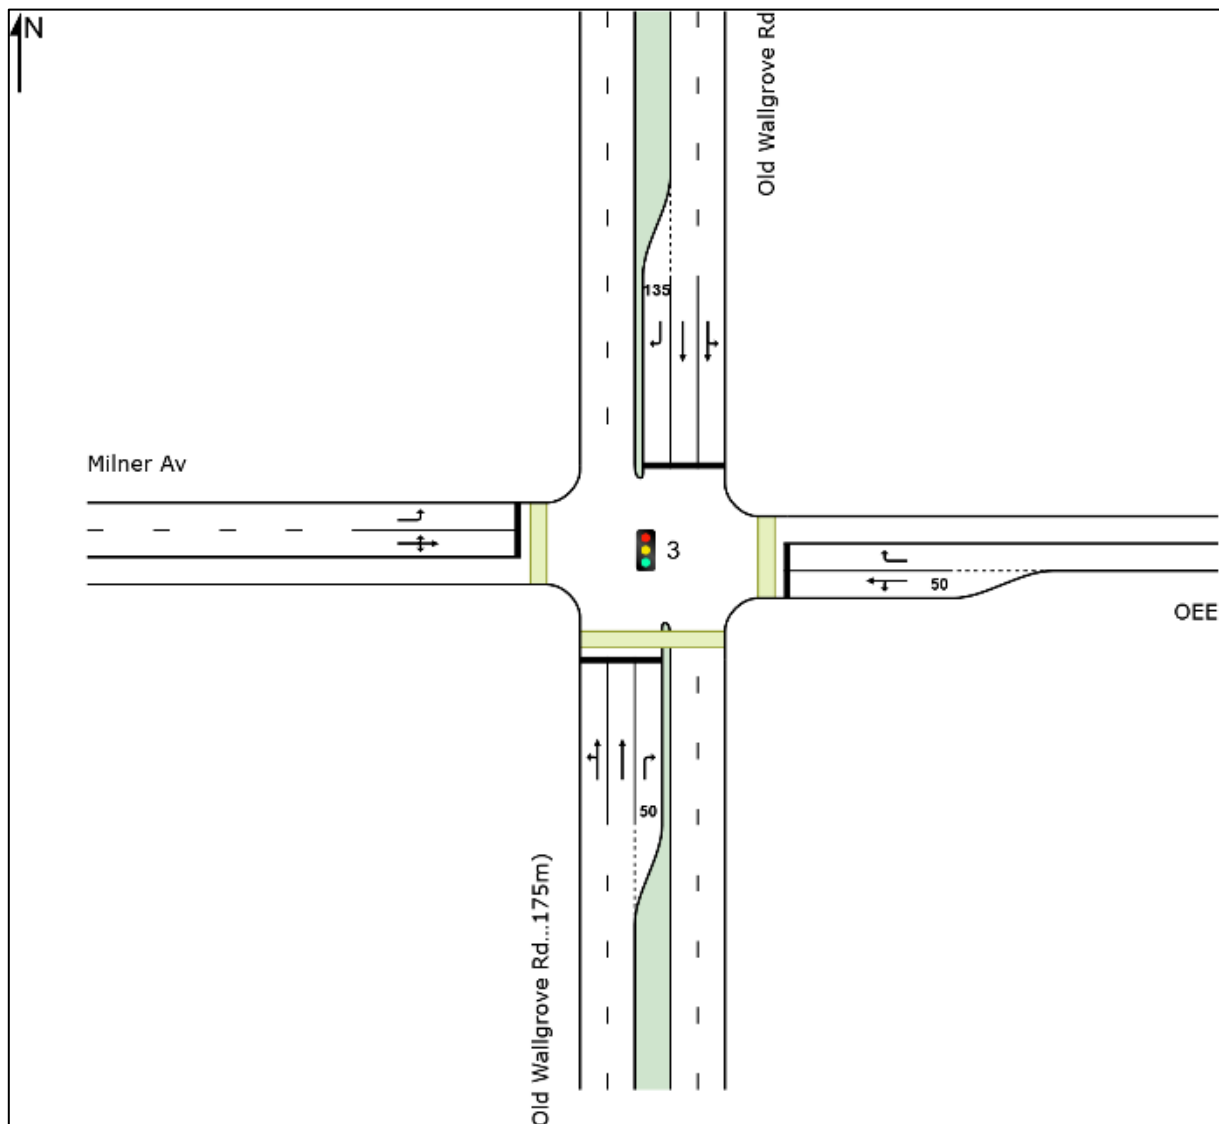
Old Wallgrove Road / Millner Avenue Intersection Layout
